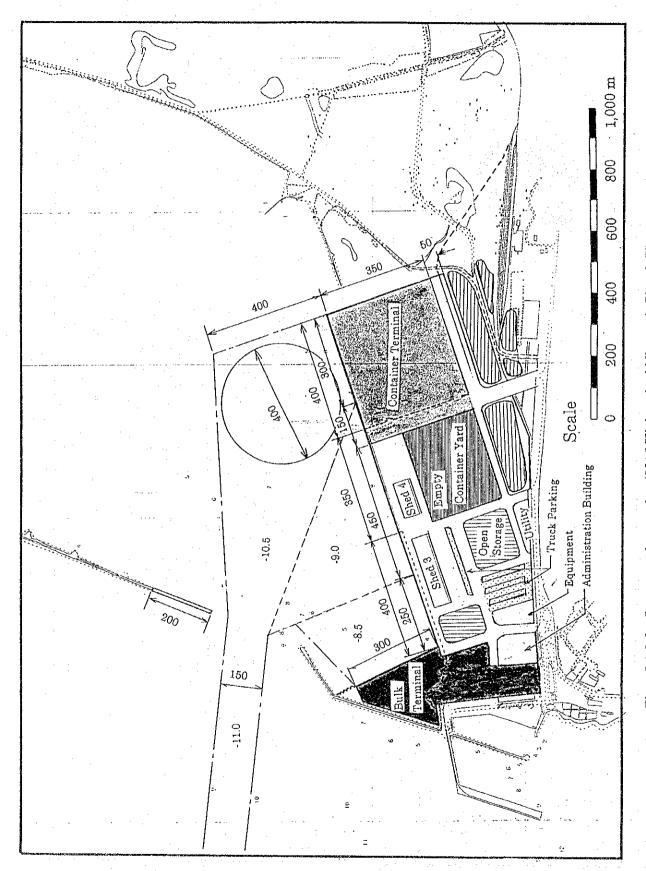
Long-term layout plan (2015, High and middle case), Plan-2 (H-2 and M-2)
